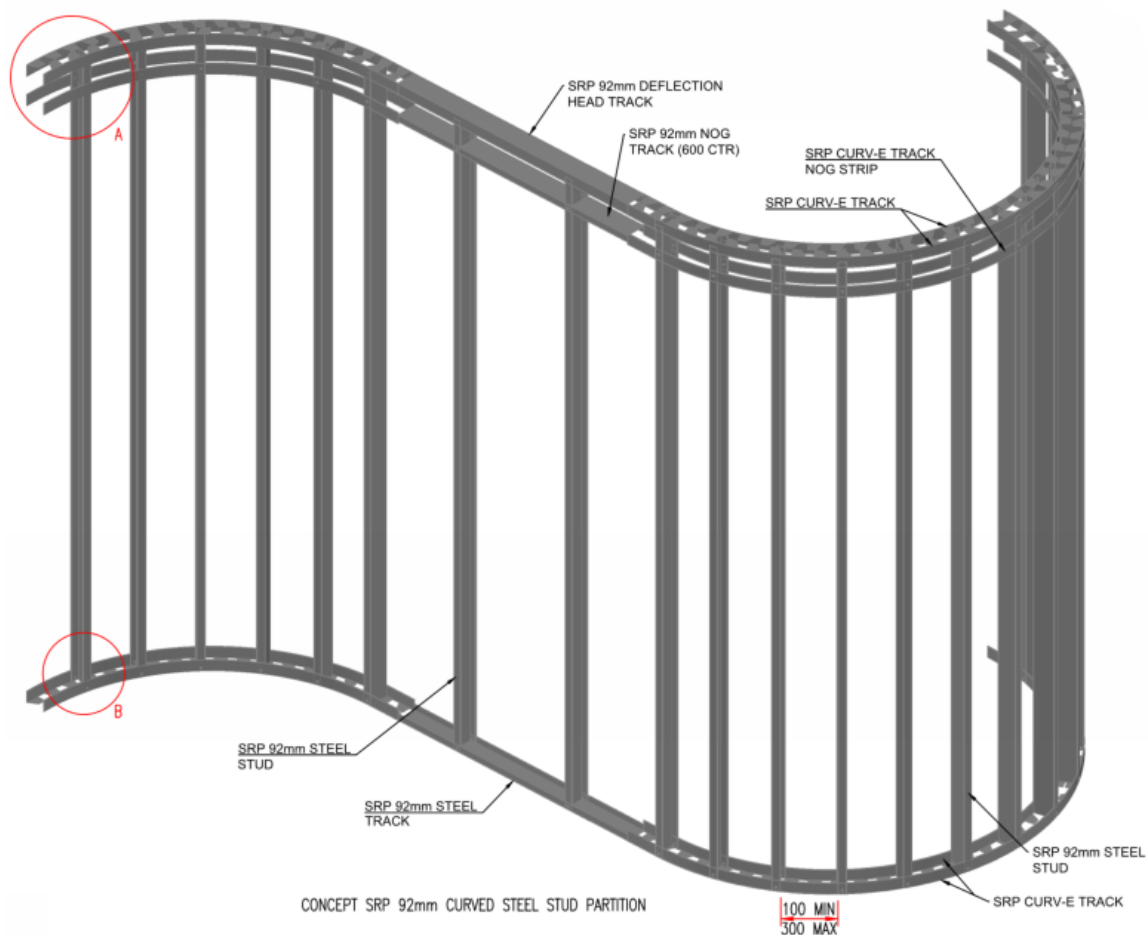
General View of a typical Steel Rollformed Products Curv-E Track Wall System System
